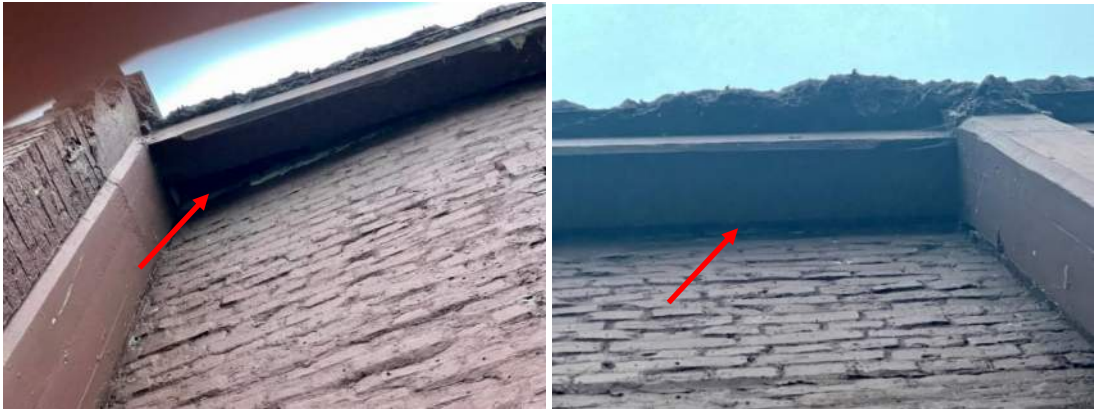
Common pipistrelle re-entry locations at Southern Boundary Wall close up
